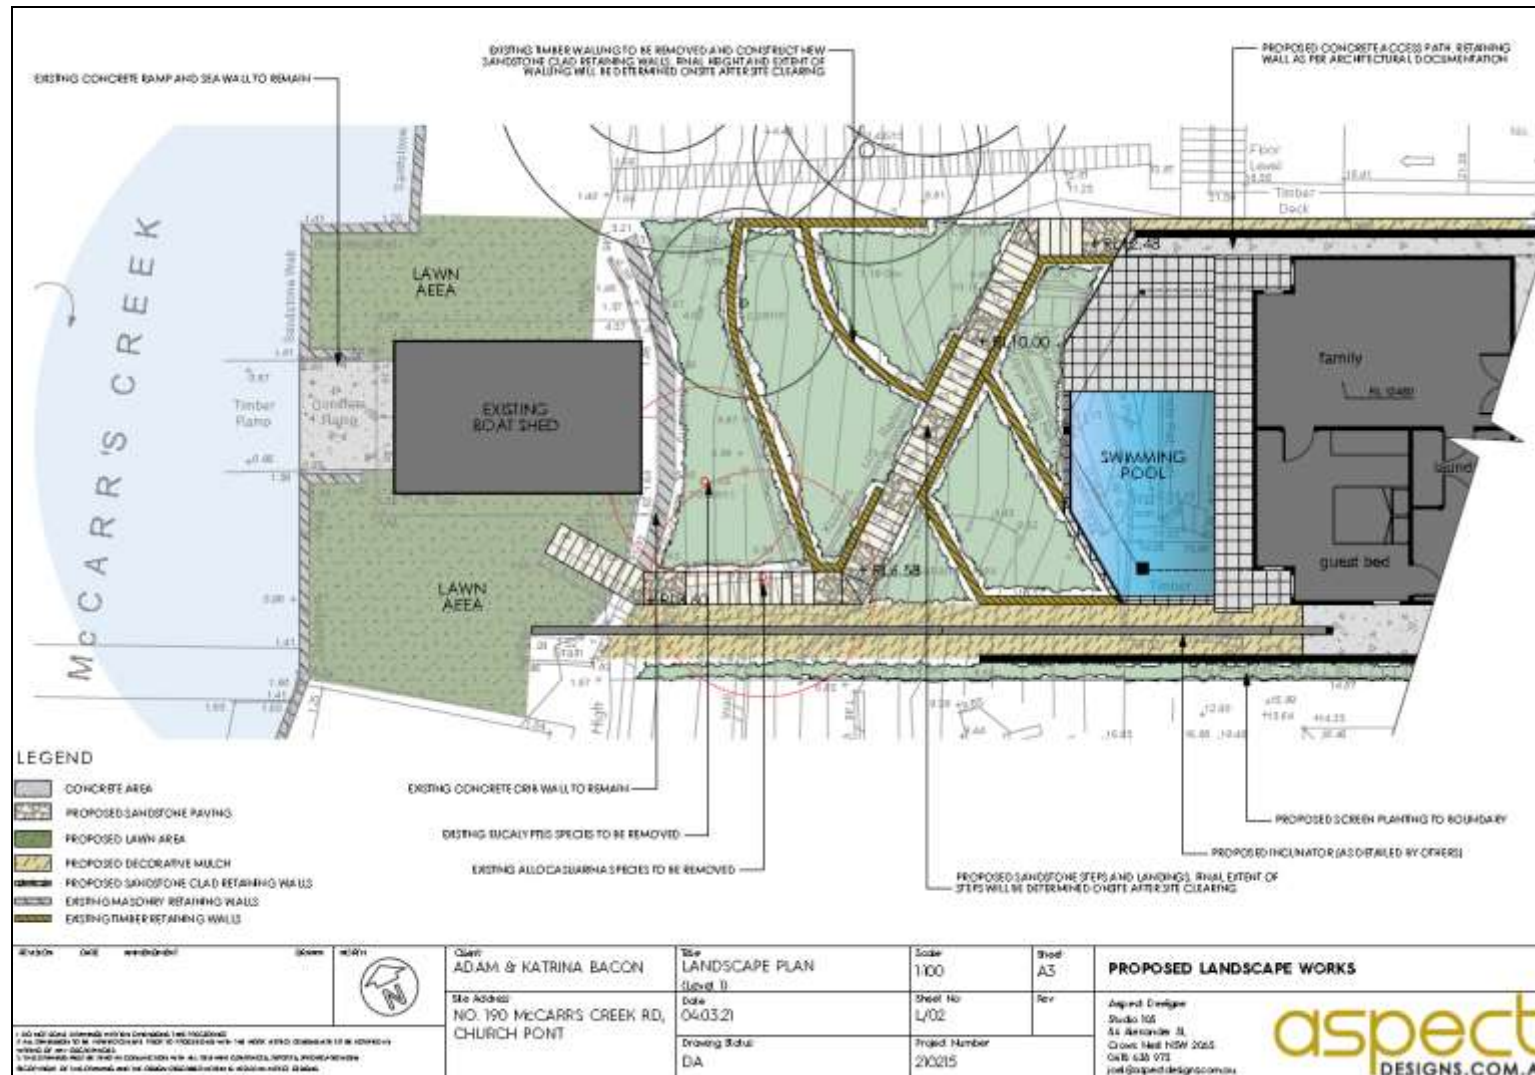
Illustrates proposed Plans, Elevations & Landscape Concept.
